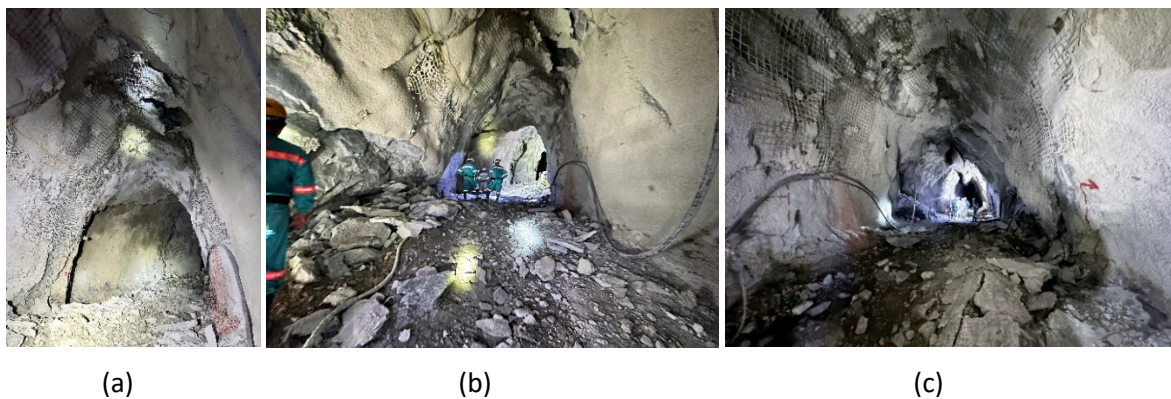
Rockburst damage: (a) Shakedown; (b) Hanging wall damage; (c) Footwall heave
